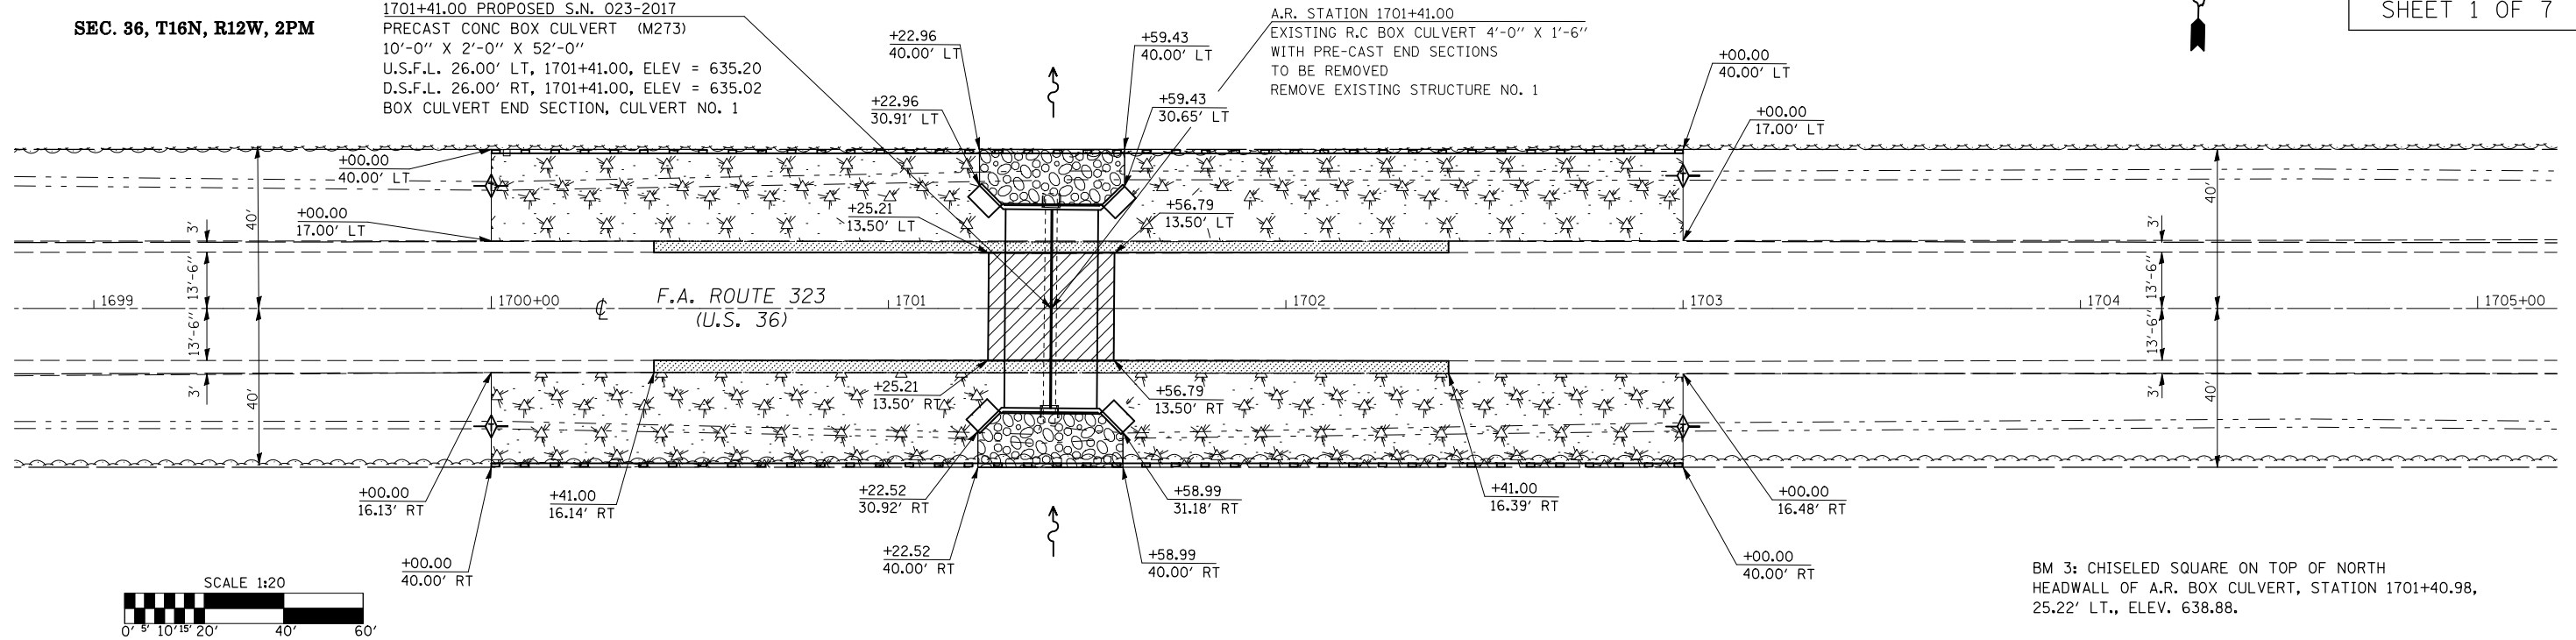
DETAIL OF ACROSS ROAD BOX CULVERT NO. 1
